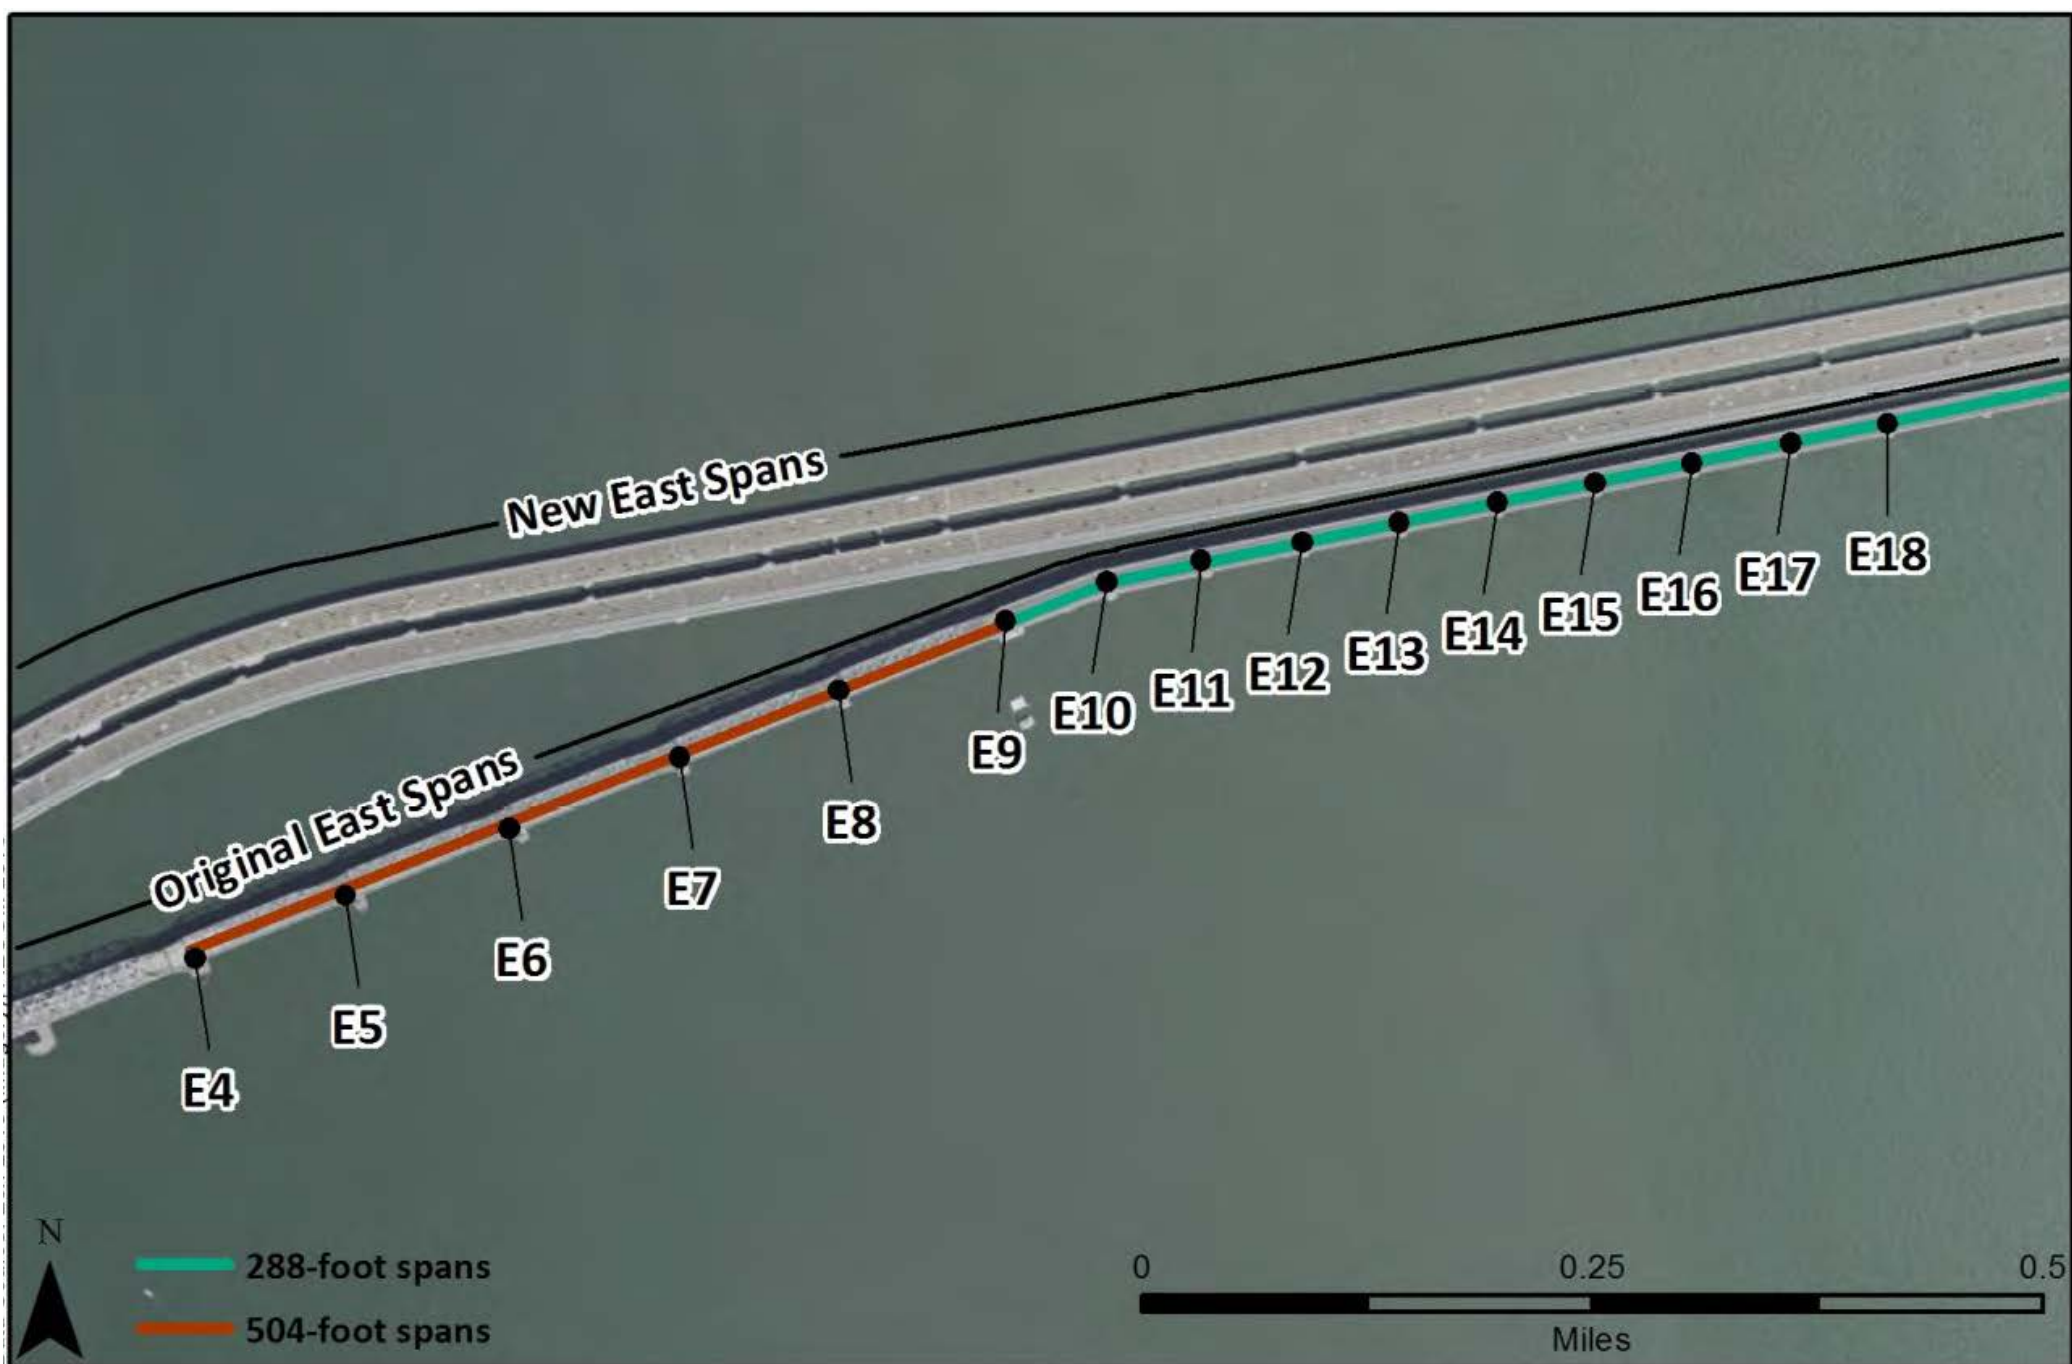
Locations of Original East Span Marine Foundations, Piers E4 to E18
